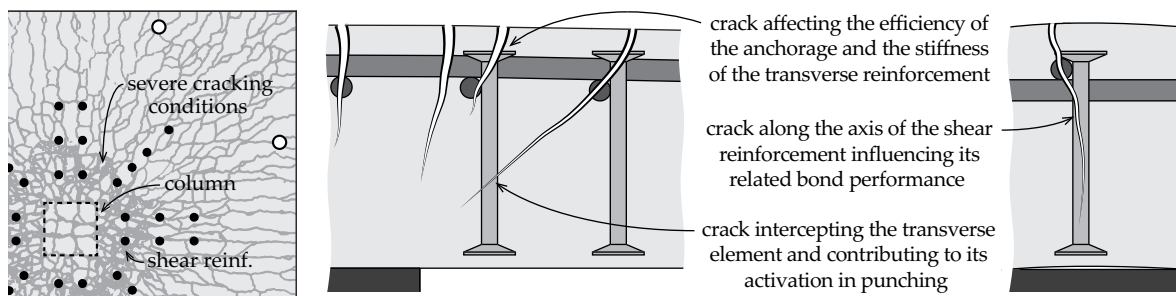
Cracks in punching phenomenon: typical surface crack pattern of a slab specimen reinforced with transverse elements (at failure) and related saw-cuts in the main directions
